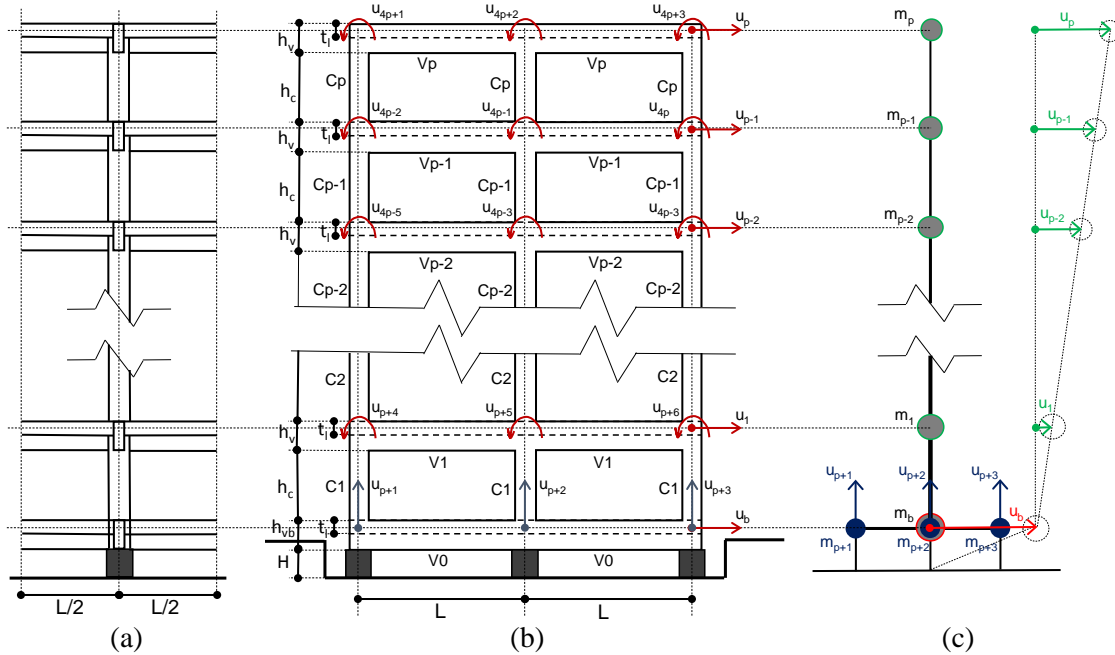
Scheme of the structure. (a) Tributary width and section. (b) Elevation of the frame and d.o.f. before condensation. (c) Condensed d.o.f. and masses of the isolated structural model
